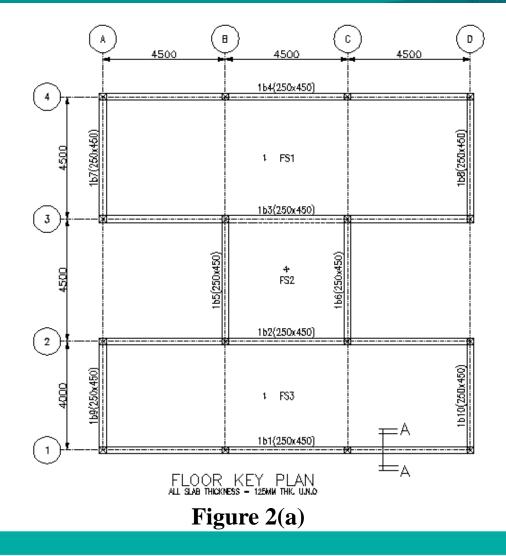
(a) shows part of the floor plan of a reinforced concrete office building. During construction, slabs and beams are cast together. Figure 2(b) is the cross-section of Beam 1/A-D using the previous design for office building. This office building was later changed to become a retail shops which cause all slab panels to carry a larger variable action. Design data related to the action and construction material are as follows:
